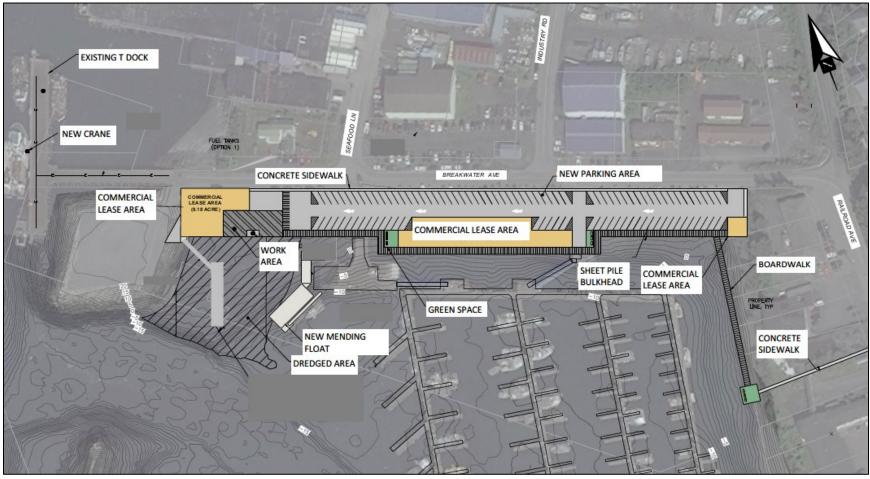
Cordova Harbor Rebuild Project North Waterfront, Three-Stage Dock, and Boat Launch Ramp Site Plans – Phase II
